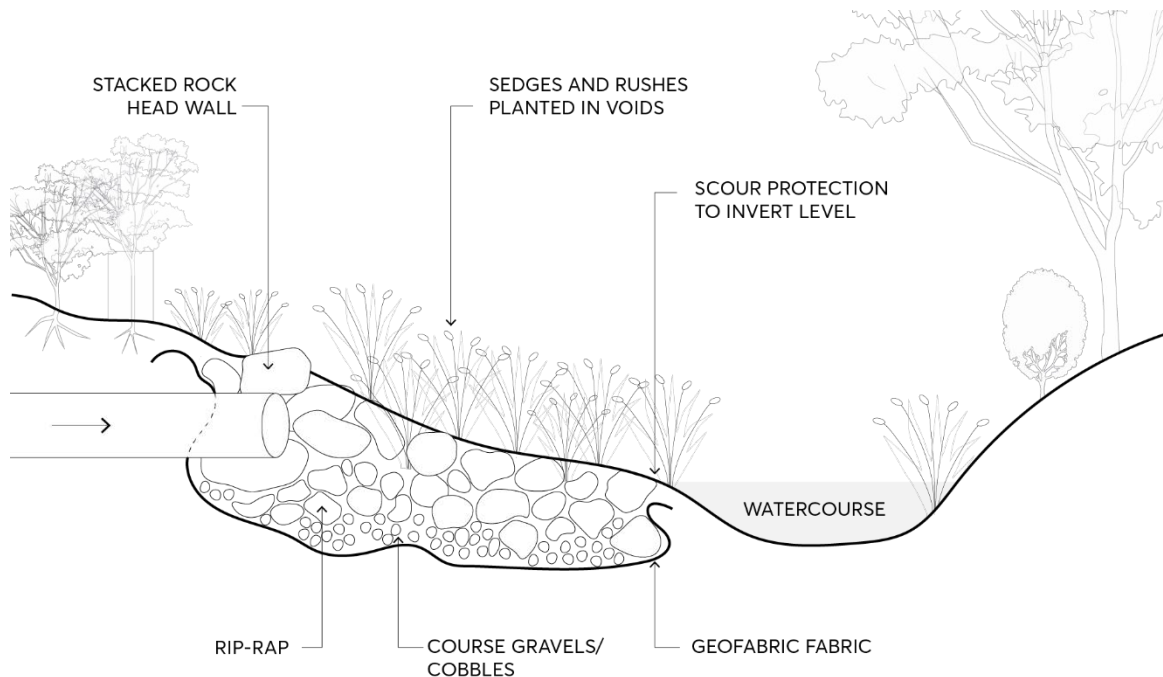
Stormwater outlets into natural waterways
